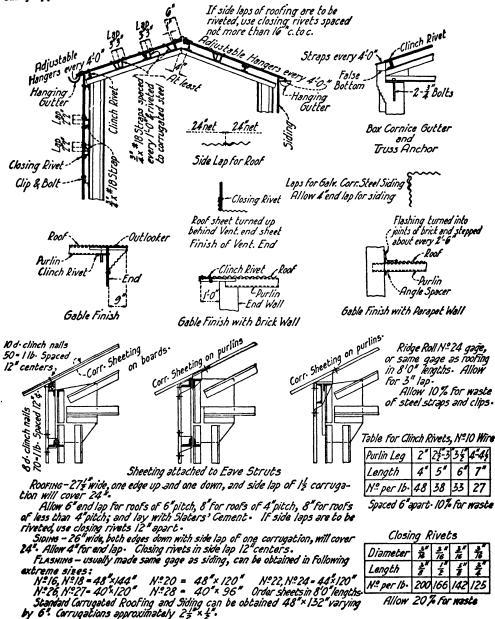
STANDARD DETAILS FOR CORRUGATED STEEL.
